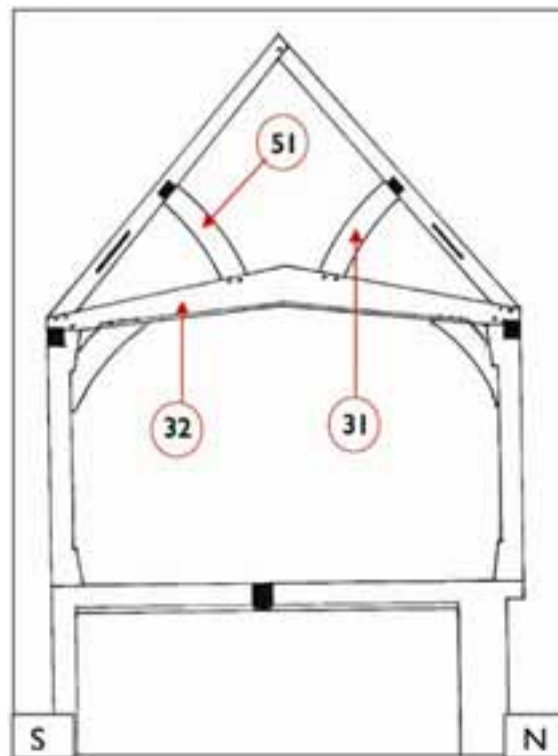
North cross-wing truss 6 showing sample locations, viewed from east looking west (based on drawings provided by N Hill)
